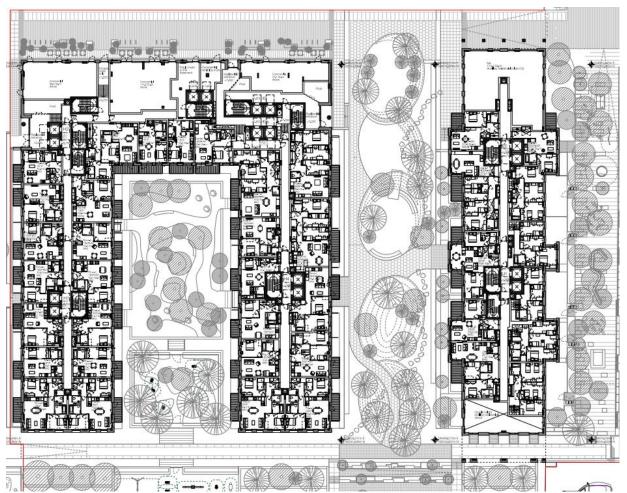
Level 1 residential floorplans. Building H to left, Building J to right
